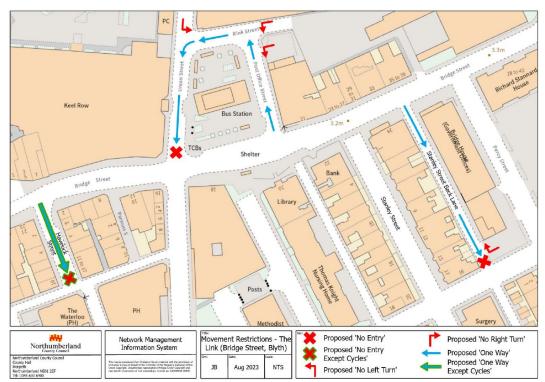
Proposed movement restrictions at Bridge Street and its adjoining roads
